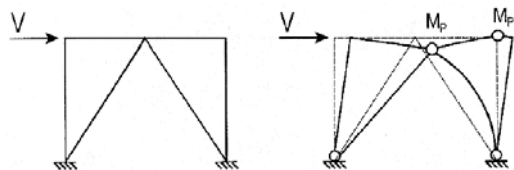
Plastic mechanism for a chevron braced bent configuration that would introduce undesirable superstructure damage (unless this bridge has only two girders that are located directly over the columns).
